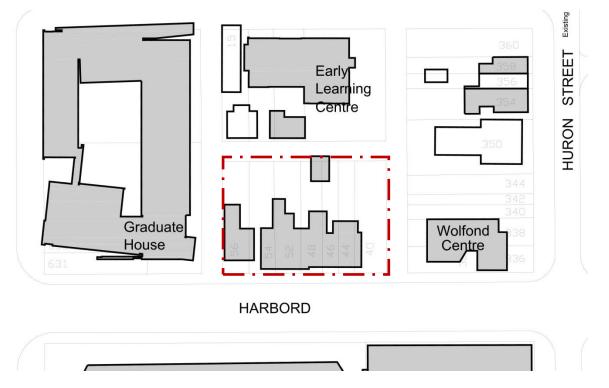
Existing Site Plan showing houses to be demolished and U of T owned property in grey
